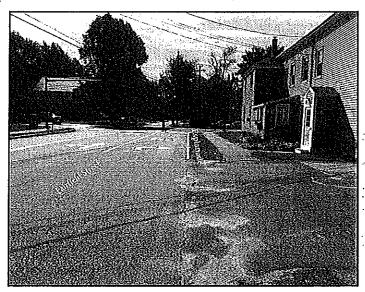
Existing Conditions View of Stormwater Retrofit Site 11B
